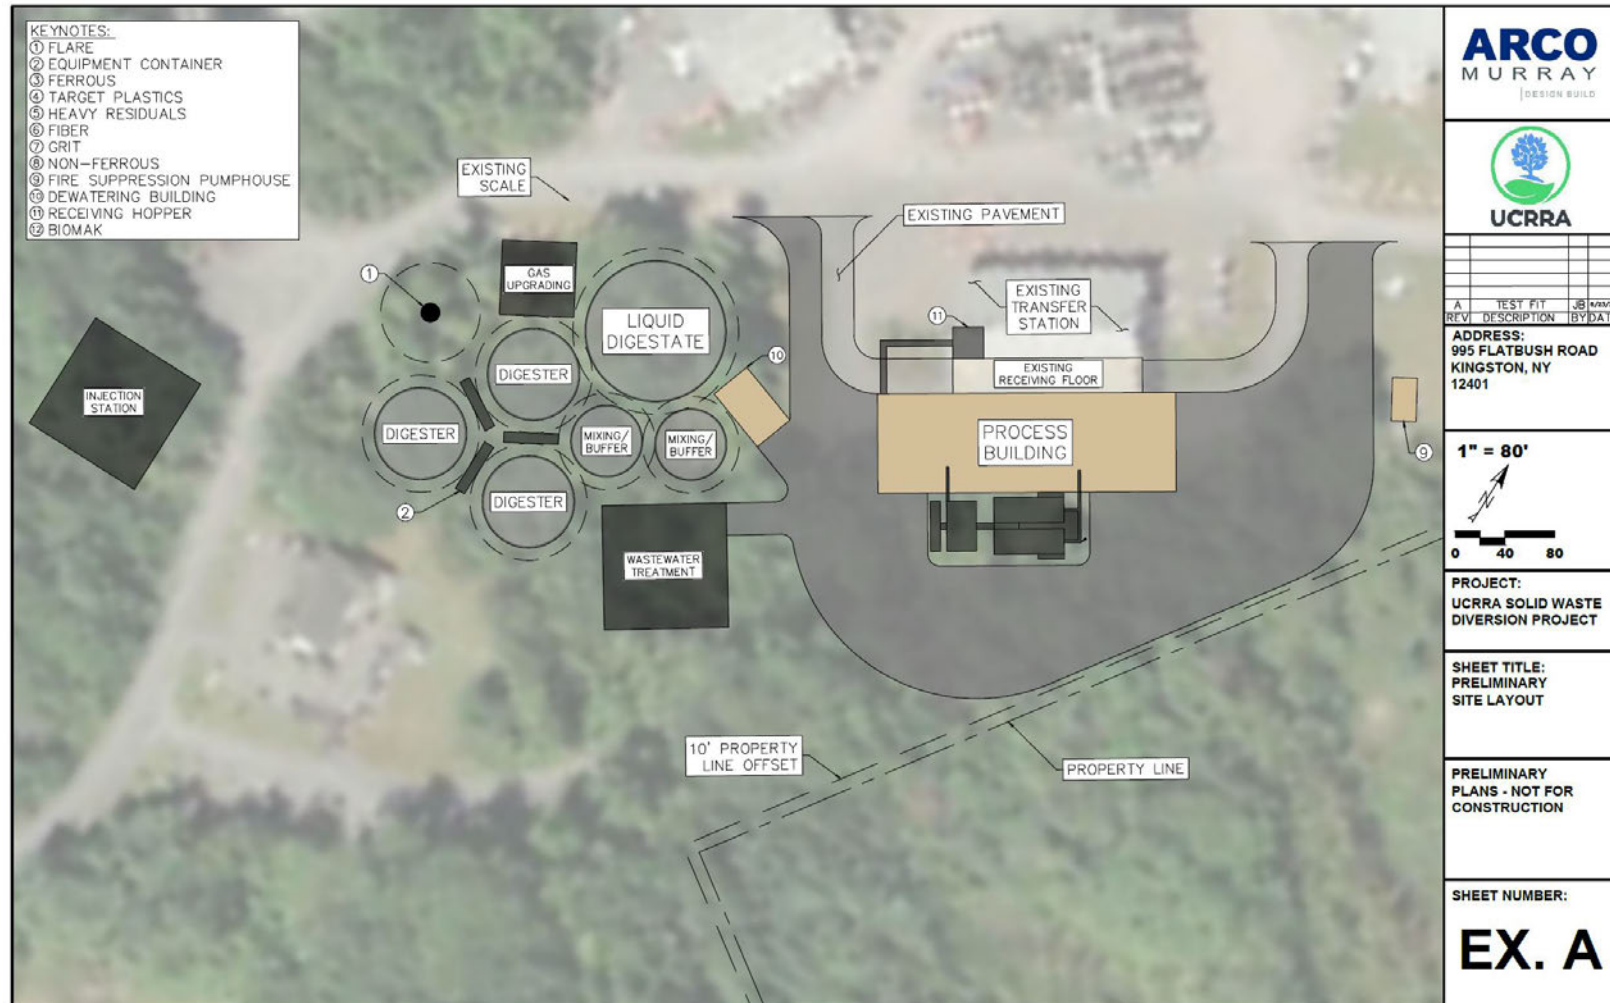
Conceptual Rendering of Ulster Site Plan Layout Zoomed In
